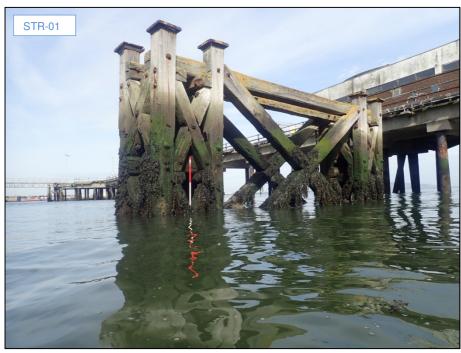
Timber structure (STR-01) located *c.* 14m north of a culvert for the Pigeon House outfall works at ITM 720262E, 733622; STR-01 is thought to be associated with those works, completed in the 1906 (1m scale).
